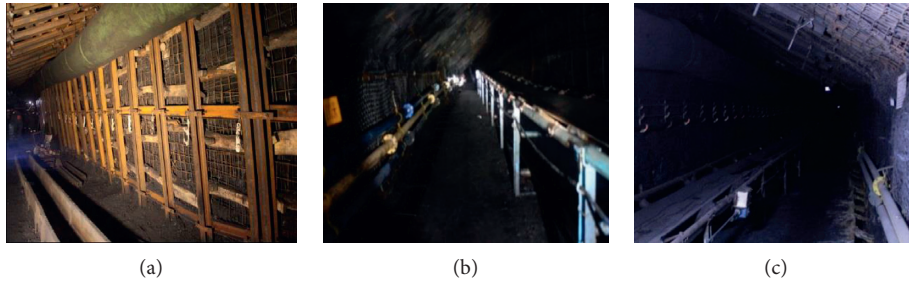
The effect of roadway support in 12032 longwall: (a) class-I roof roadway, (b) class-II roof roadway, and (c) class-III/IV roof roadway.
